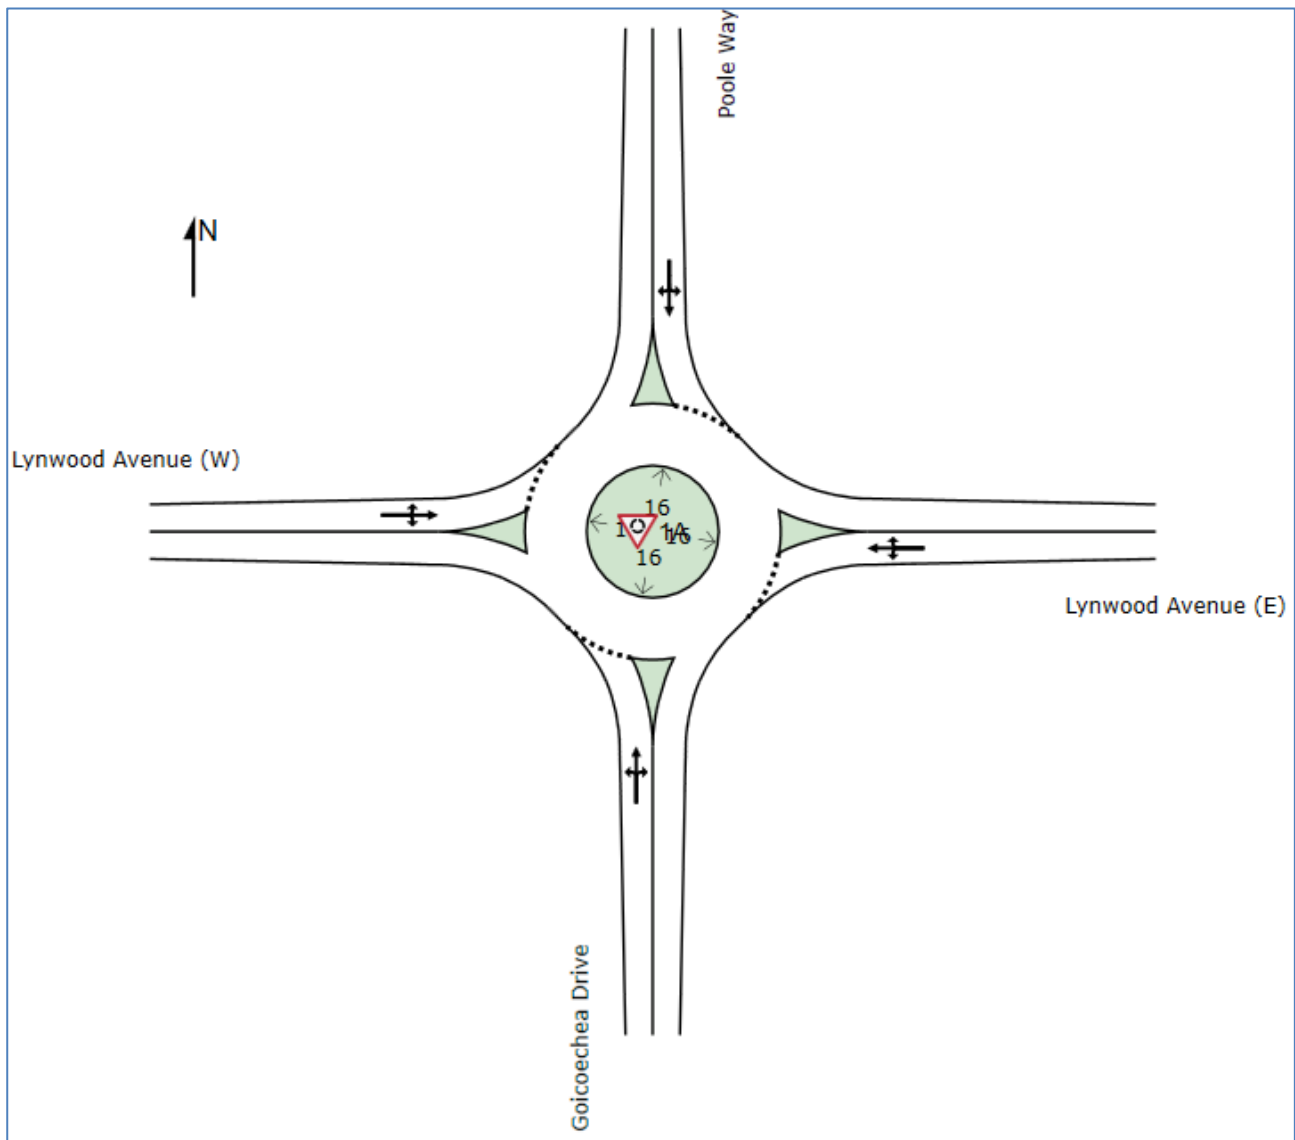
Lynwood Avenue / Goicoechea Drive / Poole Way Intersection – SIDRA Layout
